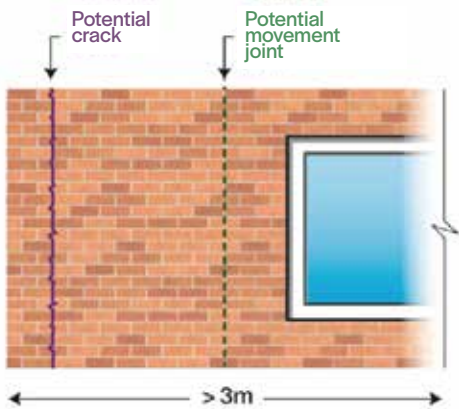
Corners are very stiff joints. A run of brickwork more than half the minimum allowance can lead to cracking near to the corners.
